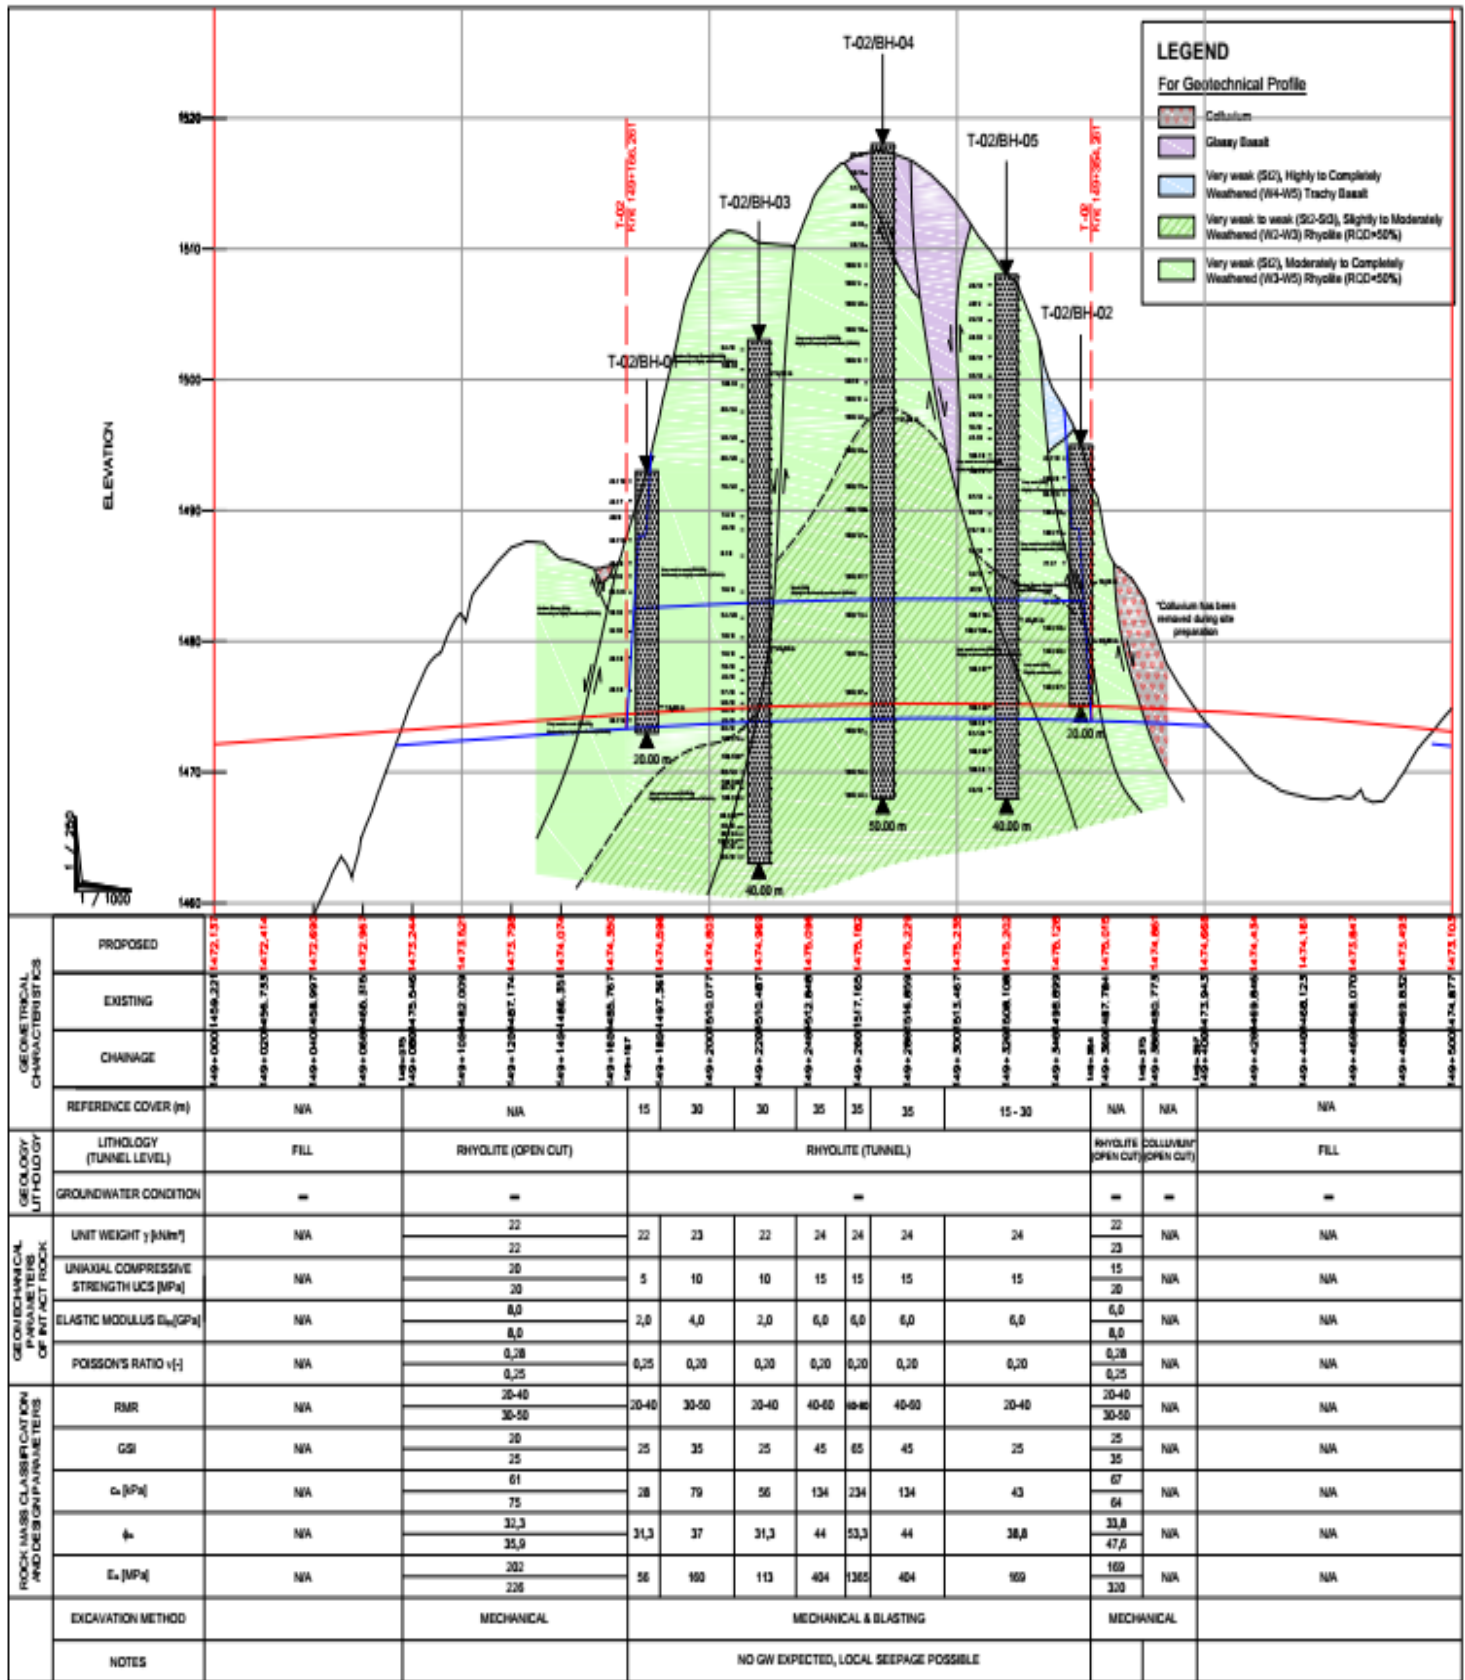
Cross-section of tunnel T-02.(Source: ERC and AWH railway project office)
